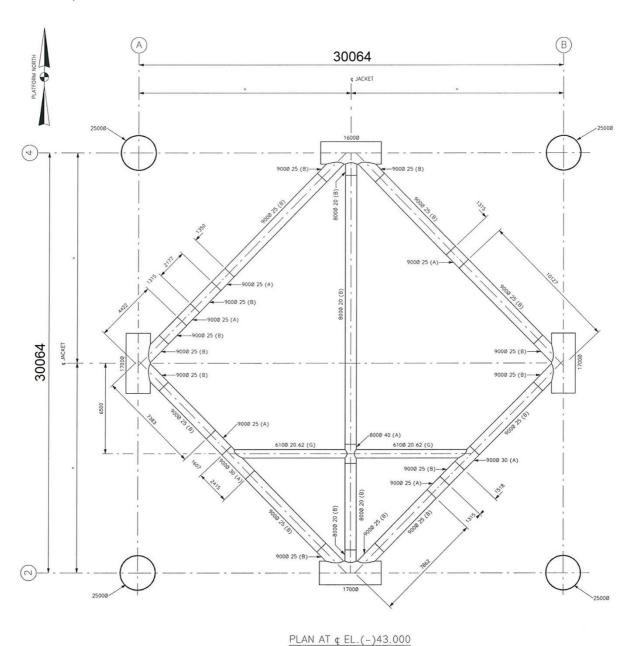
Solan jacket bracing plan at EL. -43.000
